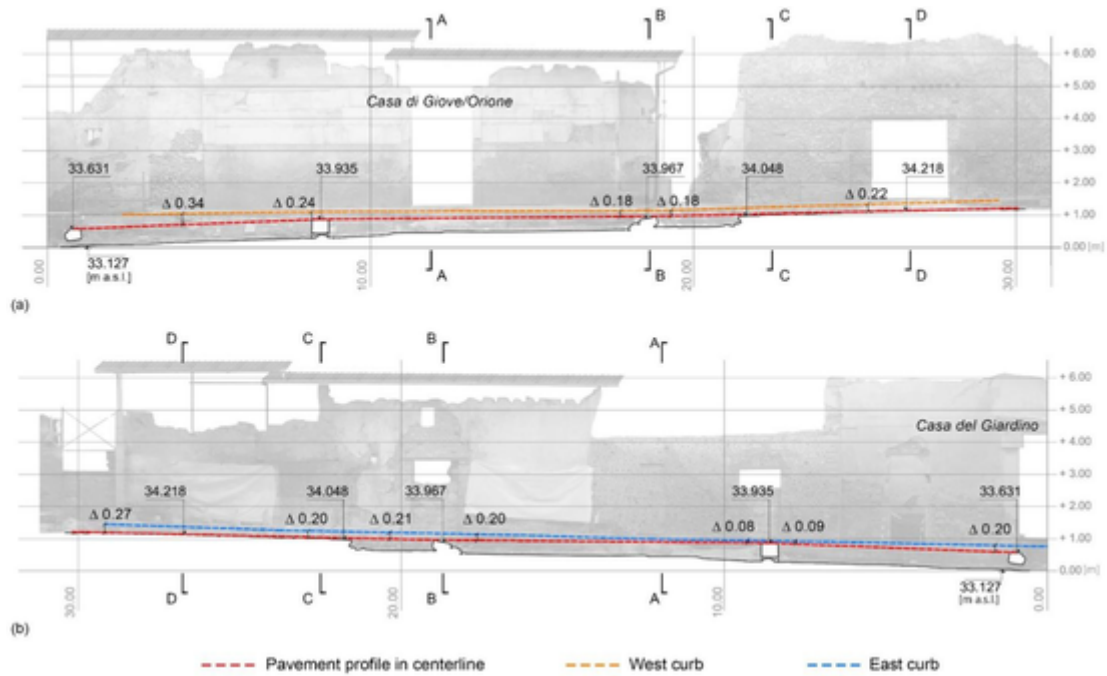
Curb and pavement longitudinal profile: west (a) and east (b) side.
